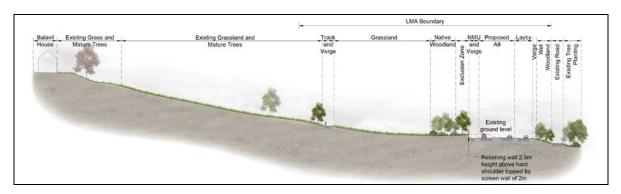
Illustrative proposals for Balavil Mains/ House Frontage – cross section
